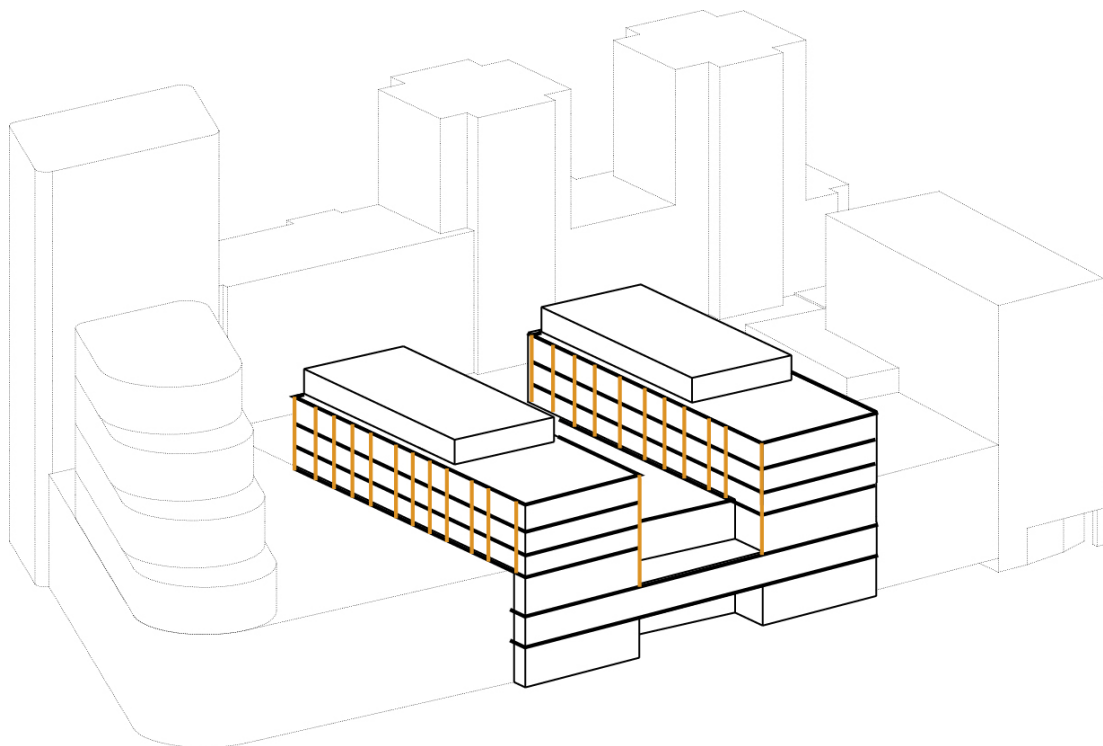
Buildings D&E articulation - Secondary vertical articulation
